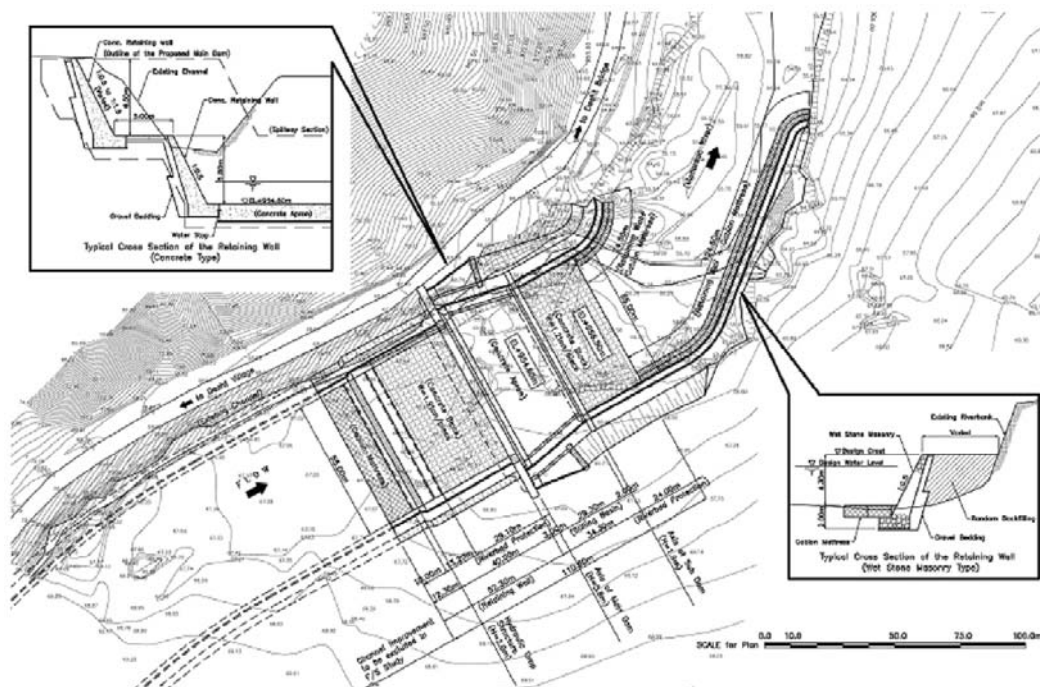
Plan of Proposed Riverbank Stabilization Works
